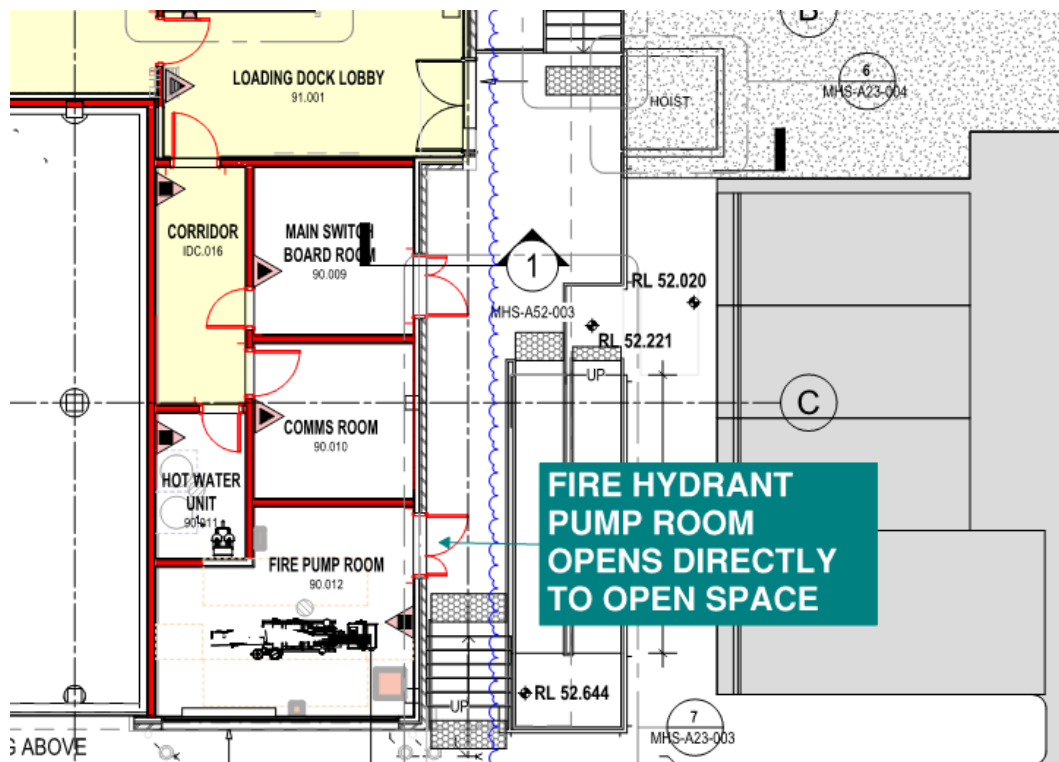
Fire hydrant pump room on Level 01 opening directly to open space
